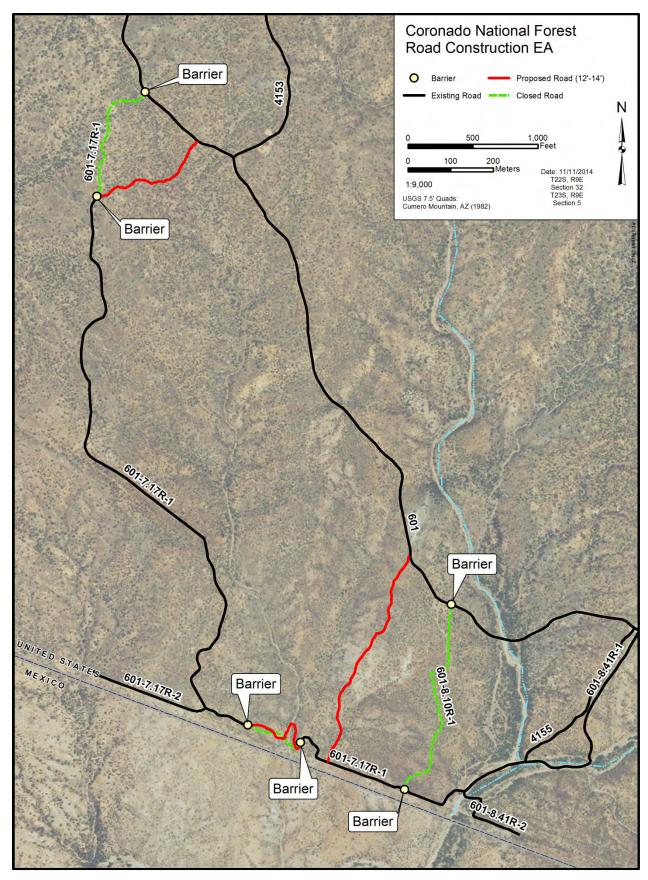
Location of proposed road construction in the Fresnal Wash area.
